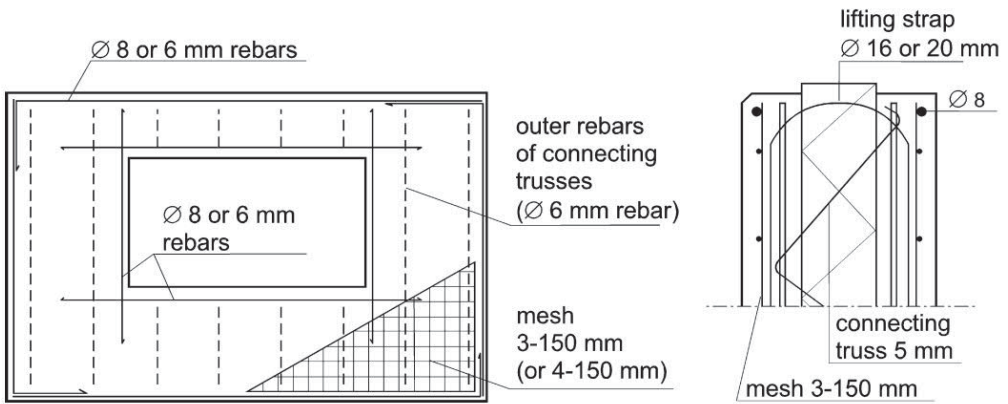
Typical facade precast element panel. (Pentti et al. 1998)
